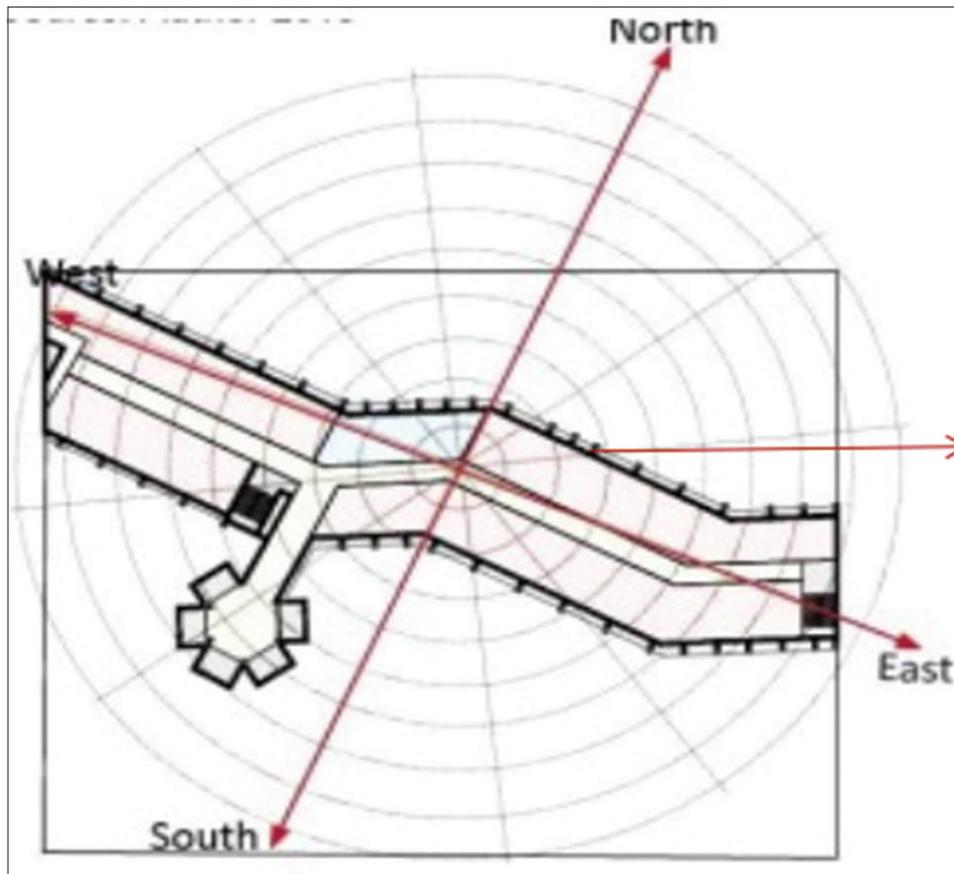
ICEA building floor plan showing North-south facing longer elevations of the building facades in evidence
